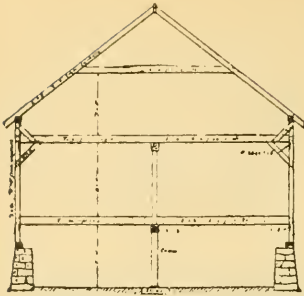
CROSS SECTION OF APPLE HOUSE.
